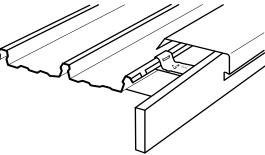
KLIP-LOK 406 Placing last sheet where half a sheet won't fit
